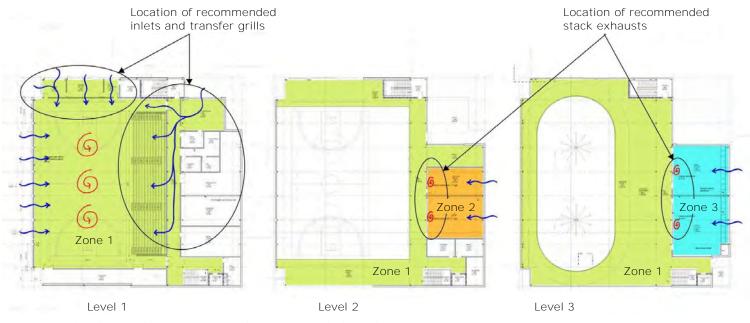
Building section illustrates recommended air flow from zone inlets to outlets
